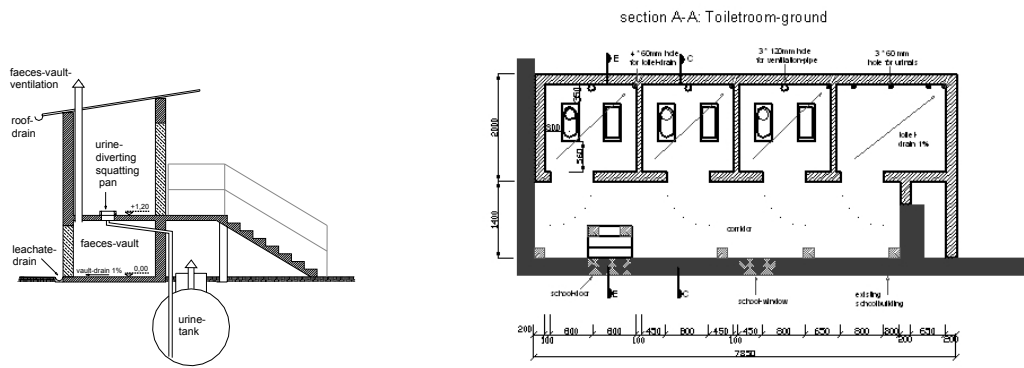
Schematic cross-section of urine-diverting dry toilets (left) and ground plan of the new school toilet
